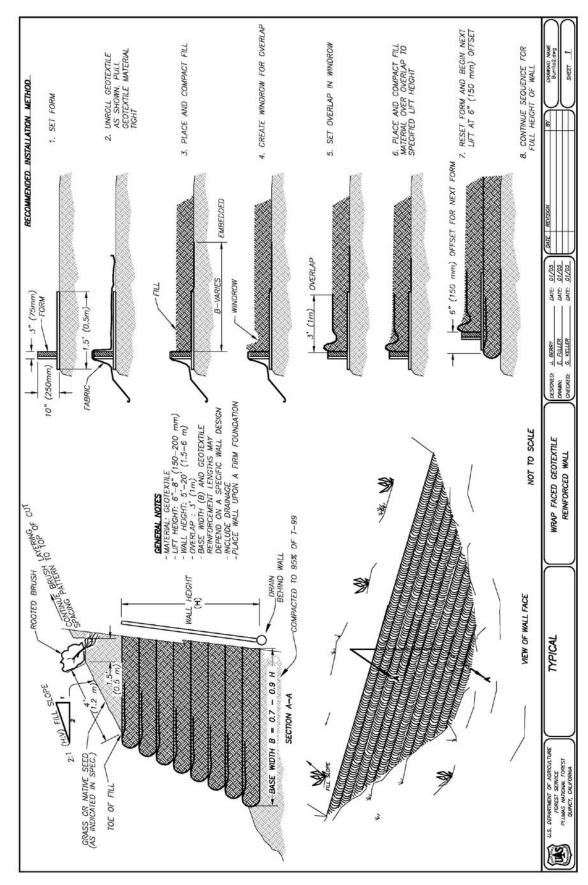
Design drawings of a wrap-faced geotextile reinforced wall.
